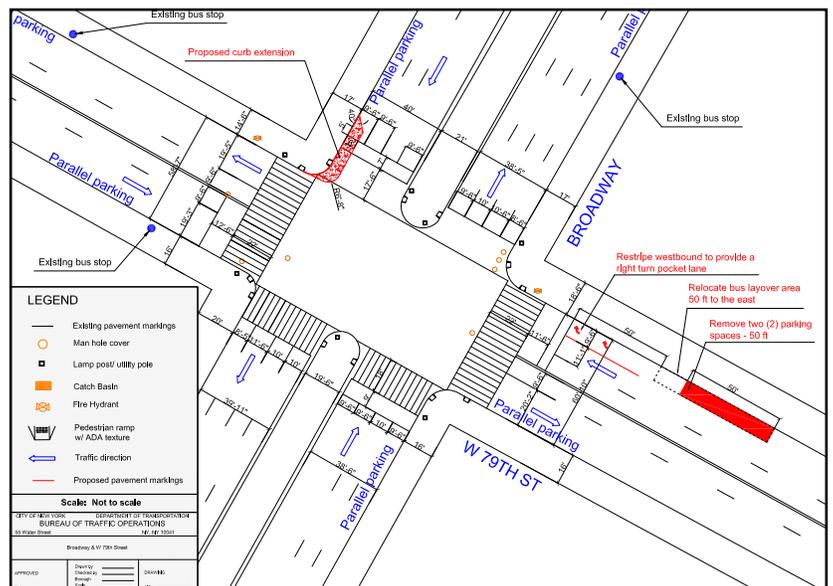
Proposed Lane Configuration - Broadway & West 79th Street
